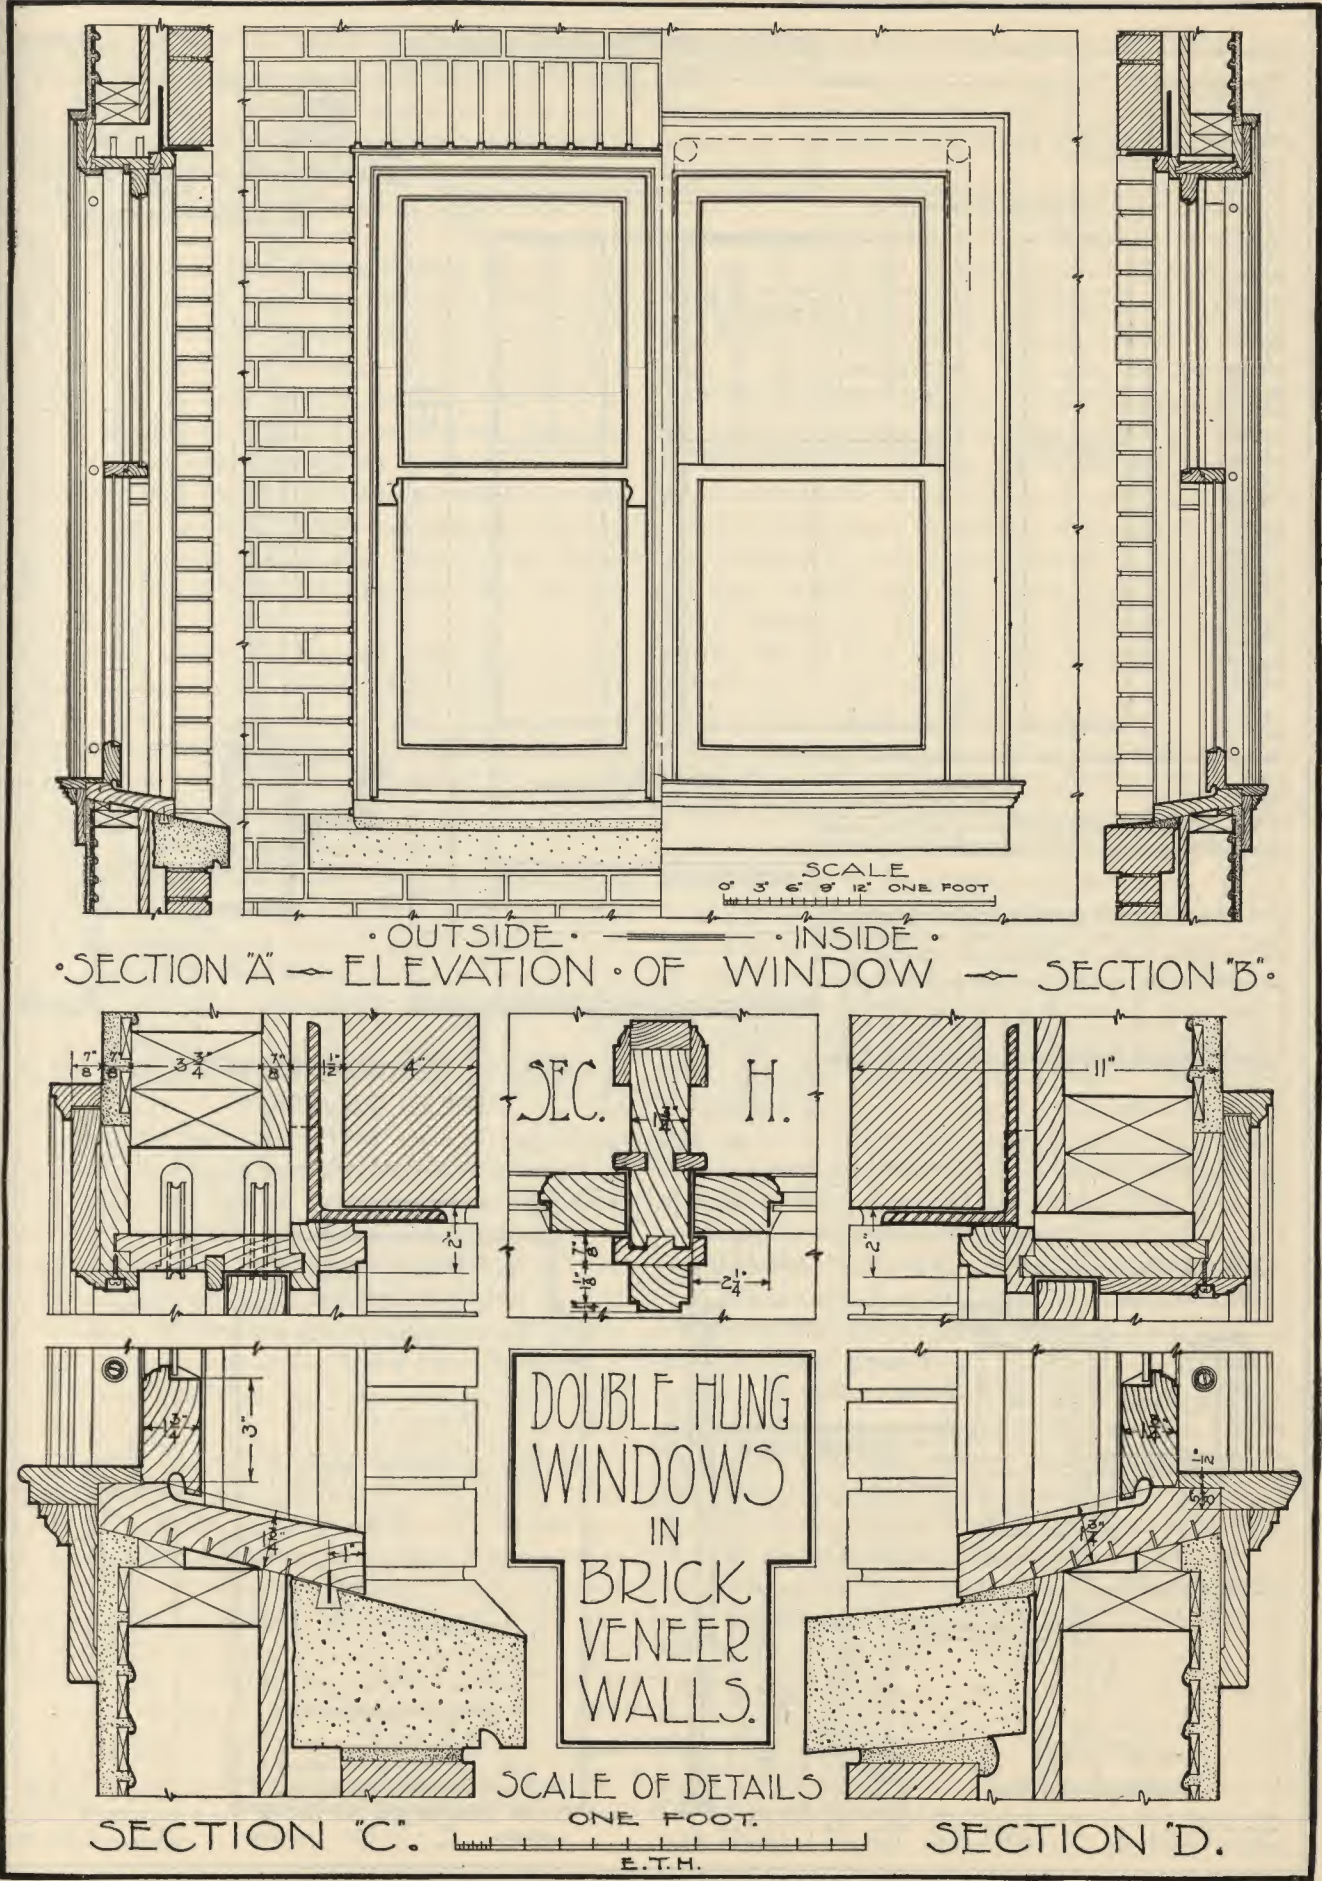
Plate X. Details of Double Hung Windows in Brick Veneer Walls.
